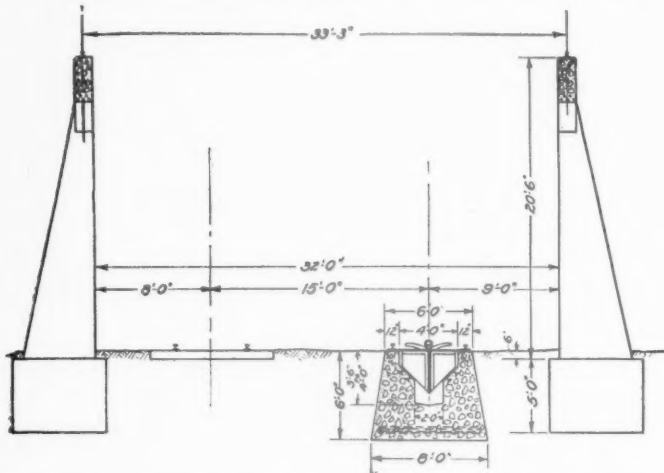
Type B, Pit Built by the Buffalo, Rochester & Pittsburgh at Lincoln Park, N. Y.
